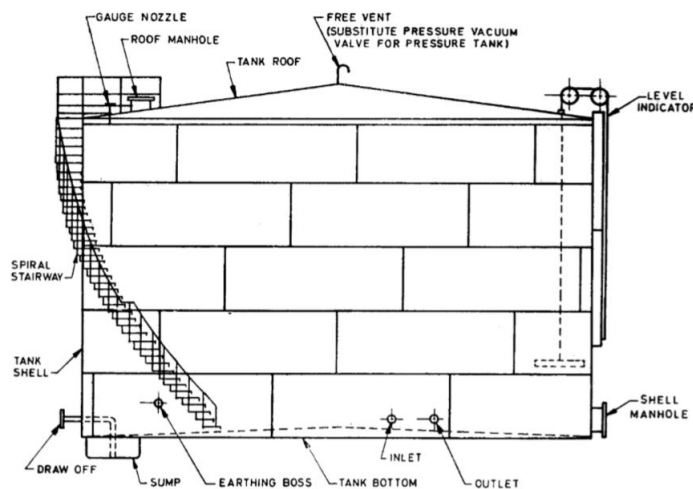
General Arrangement of Liquid Storage Tanks [2]
